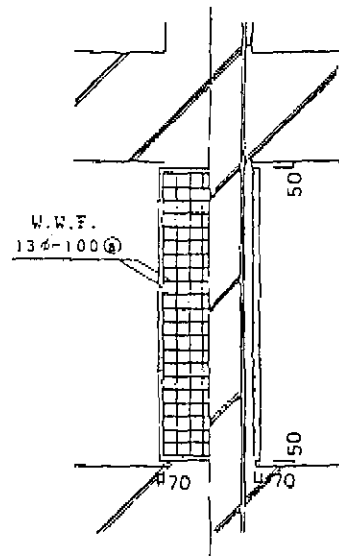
shows the layout plan of in-filling shear walls or strengthening and repairing techniques proposed for the 3rd floor.
